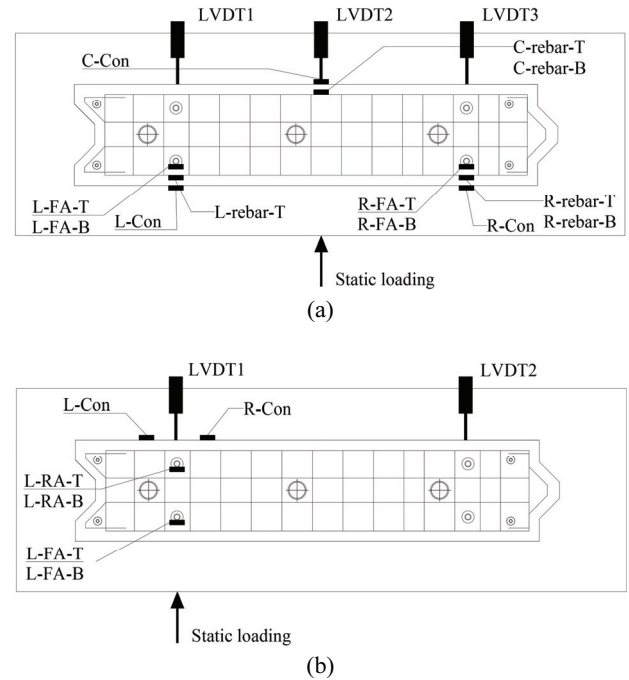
Sensor Locations on (a) the specimen loaded at center point and (b) specimen loaded on the anchor connection
